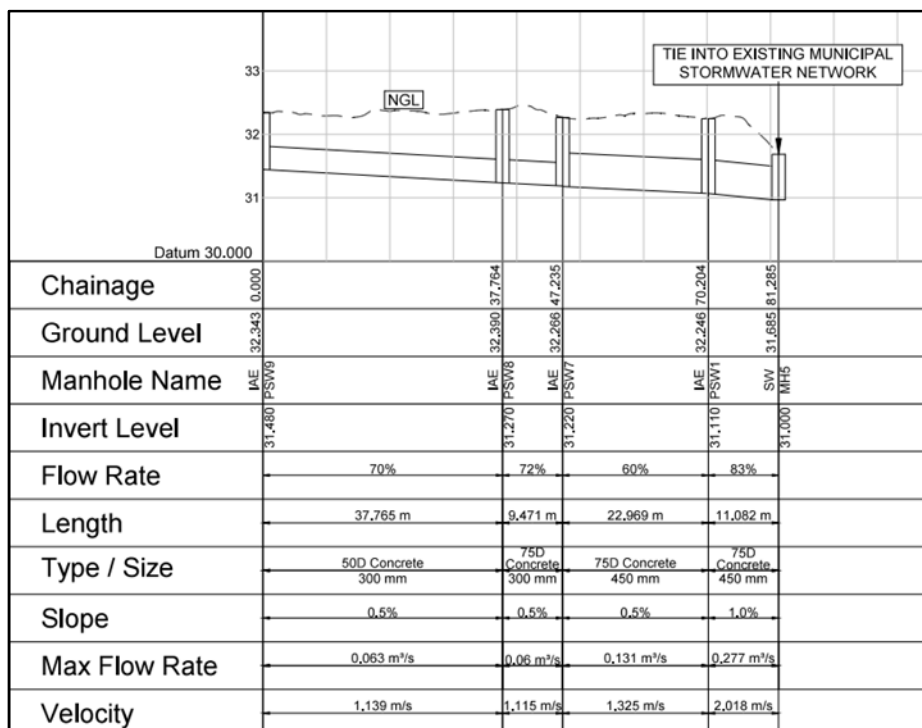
Long section of proposed new stormwater infrastructure between IAE PSW9 and SW MH5
